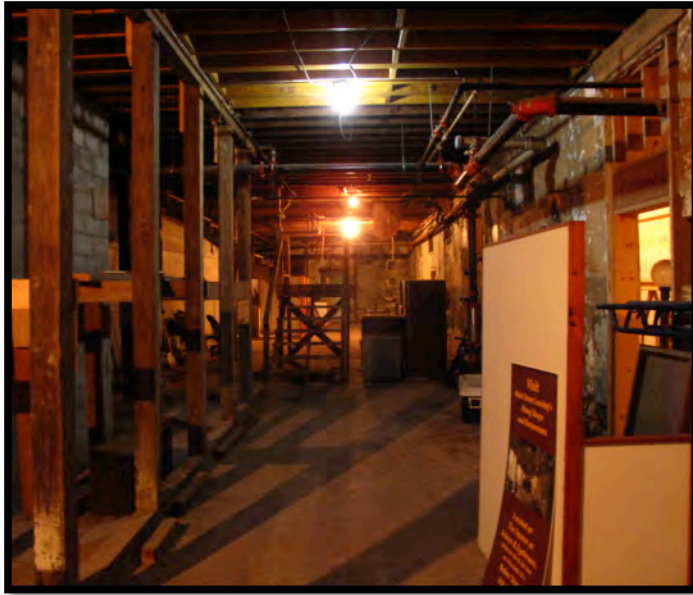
Main Street Leasing's makeshift office space is to the left. Walls are heavily damaged and a rectangular portion of the floor is missing. The ceiling is unfinished.
